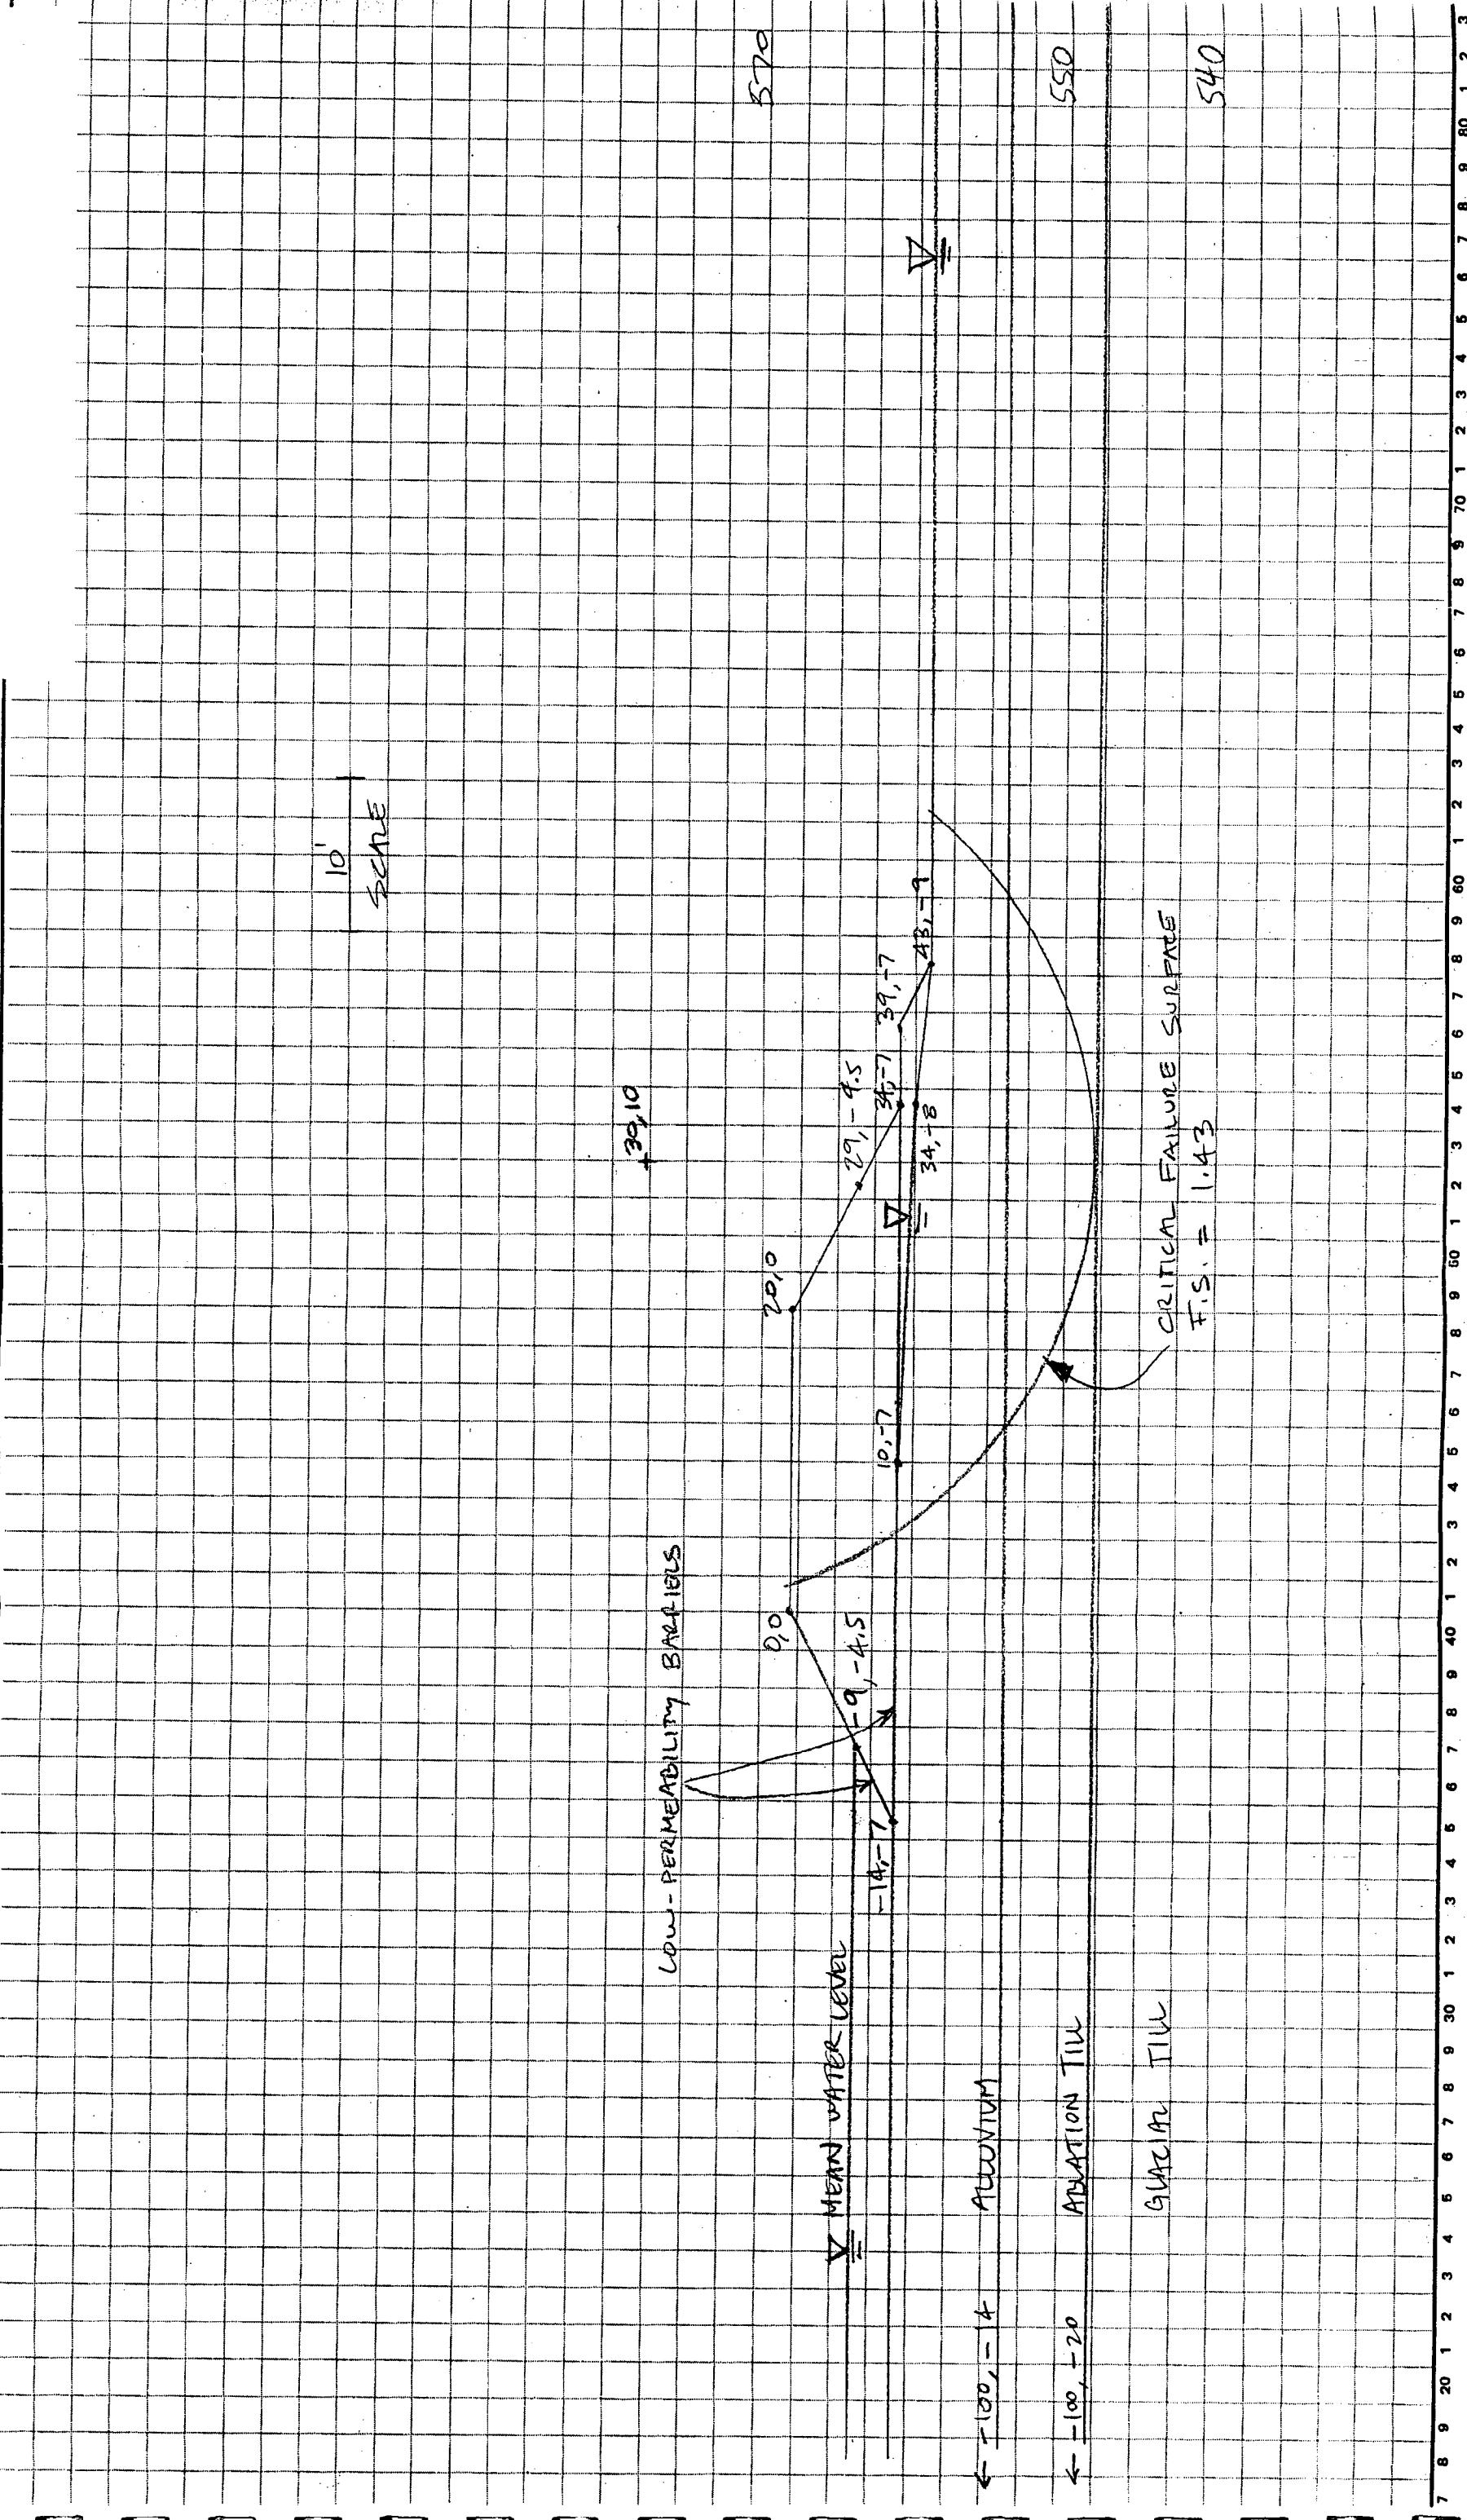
COFFERDAM CROSS-SECTION NO. 3
